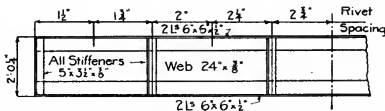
Stress Sheet of Runway Girder of Problem 2 on Page 91.
